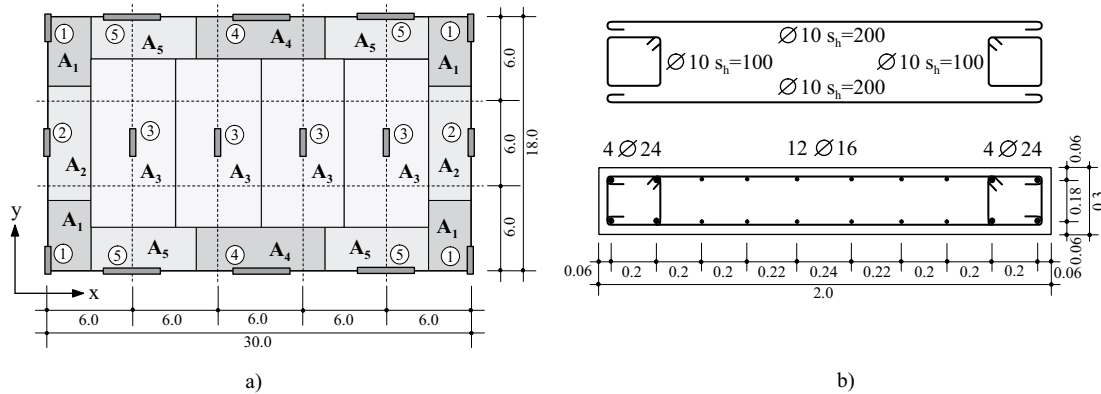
a) Plan of the example reinforced concrete building and b) wall section of walls 1, 2 and 3
